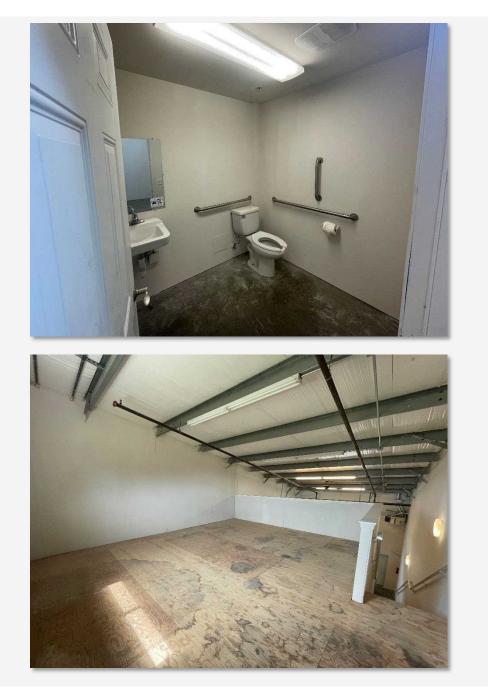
## PHOTOS- "B" BUILDING- UNIT W/ MEZZANINE
